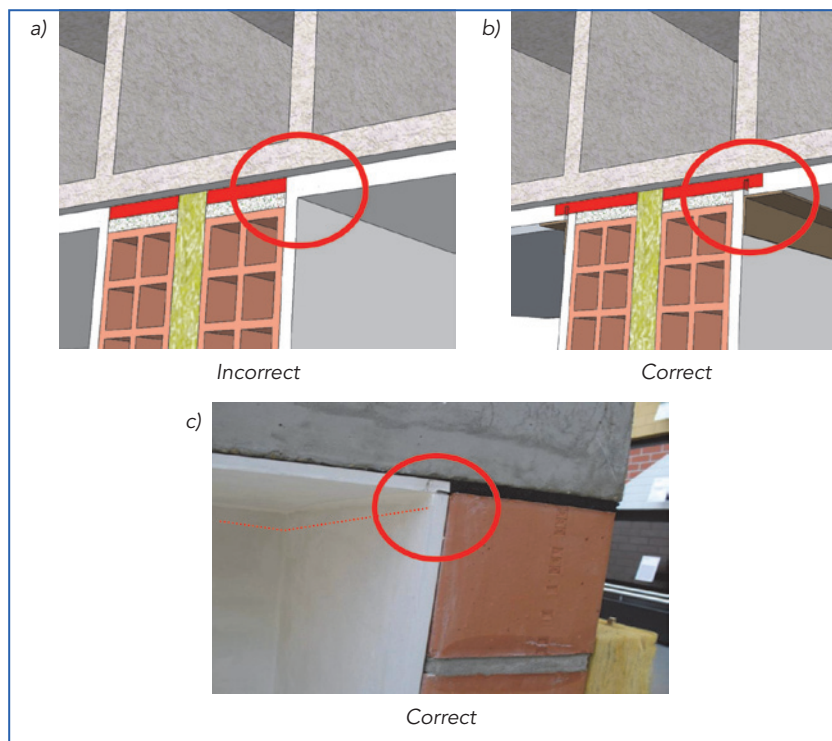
In some cases, elastic layers are placed on top of cavity separating walls to limit the flanking transmission along the floor and ceiling. When this is the case, the connections between the plaster finishes of the walls and the ceiling above must be avoided. a) Typical separating walls in Spain. Incorrect workmanship. The plaster finish of the wall bridges the ceiling. b) Correct design. The elastic layer is larger than the brick, and a cut is performed in the plaster finish. A paper band is used prior to painting the wall. The difference between good and bad workmanship can be up to 5-6 dB. c) Belgian example showing the disconnection of plaster finishes. An elastic sealant is applied along the joint.
